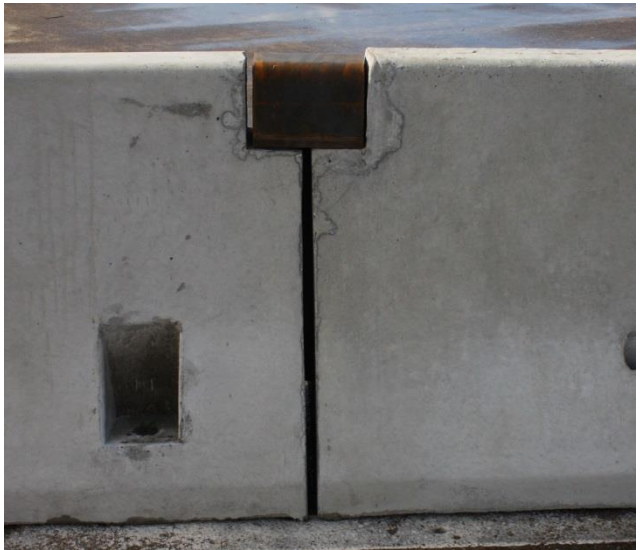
PCB Connection Key and Connection Socket, Test No. NJPCB-1
